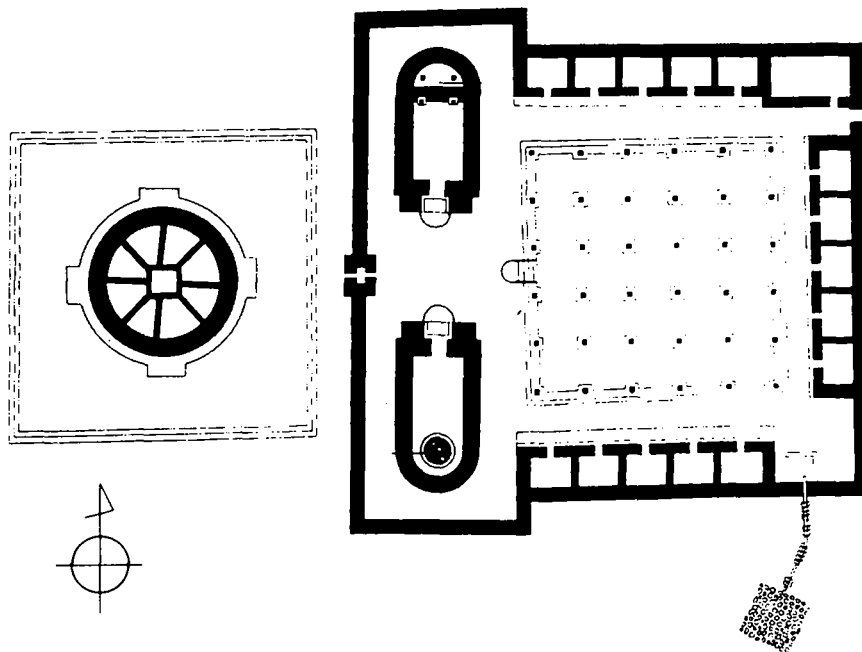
Ground plan of the temple complex No. 32 B at Nāgārjunakoṇḍa
